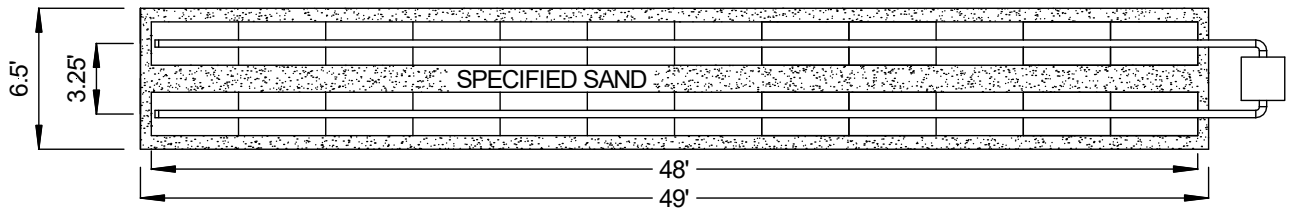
SECTION VIEW – A42 MODULES – BED SYSTEM
